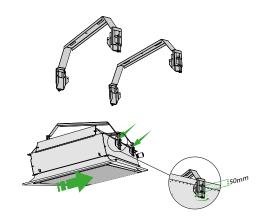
Installation with guick bracket PARASOL Z QUICK SUSPENSION KIT
